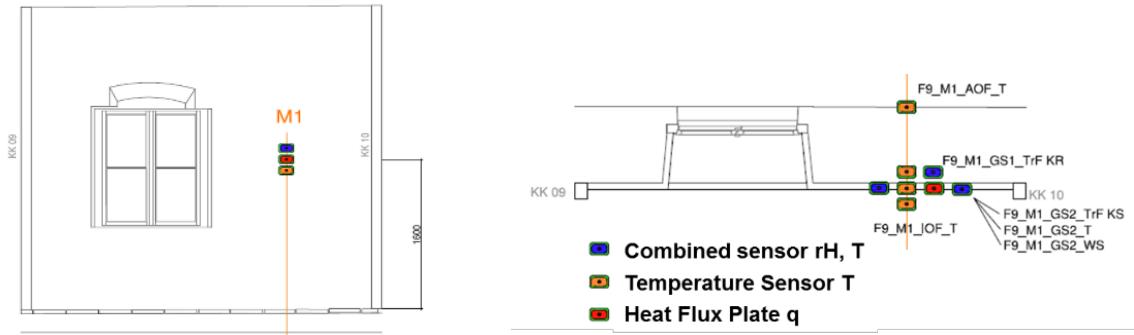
Example of a test area with typically installed sensor technology. View from inside (left) and in horizontal cross section (right).
